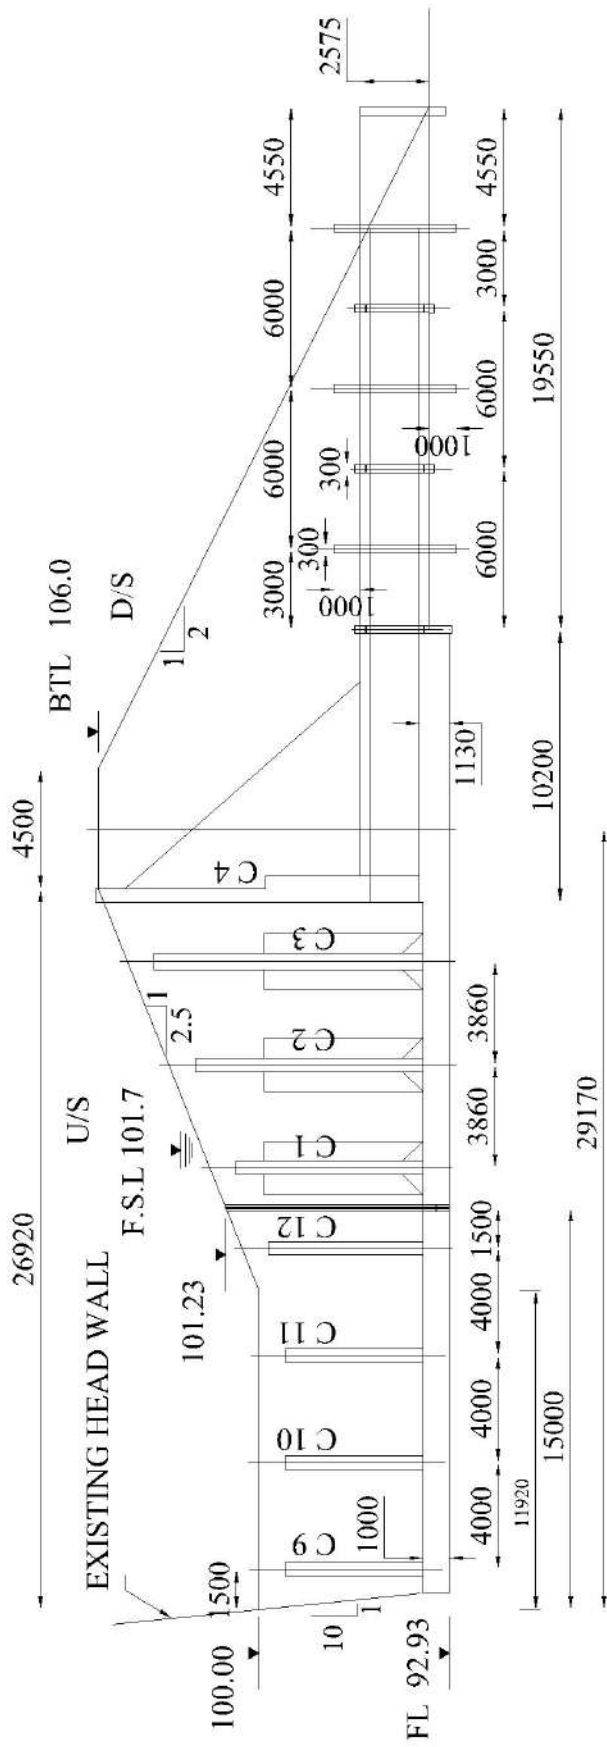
General Arrangement of Proposed Sluice of Nachchaduwa Tank
